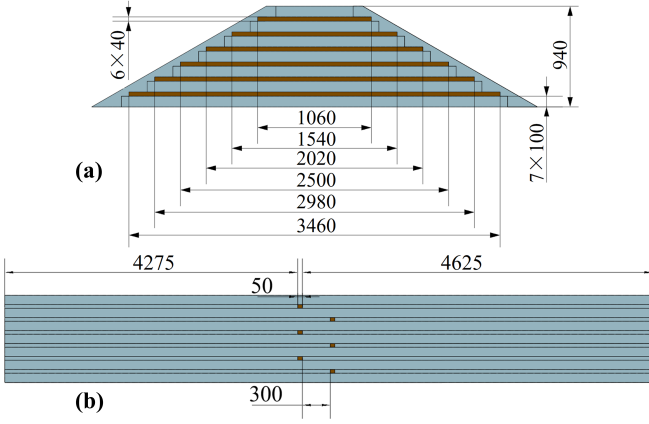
Dimensional parameters of the module: (a) Z-direction view, (b) YZ-plane cross-sectional view
